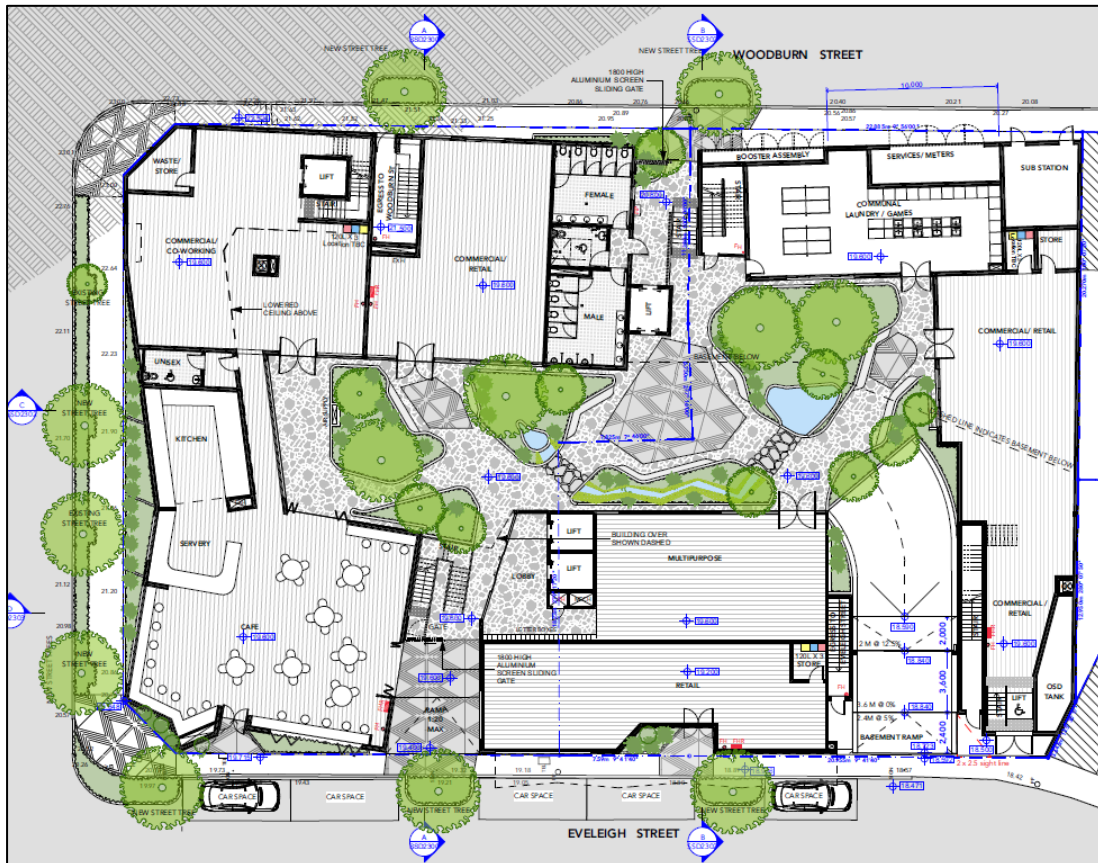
Ground Floor Plan (Source: Mark Shapiro Architects)
